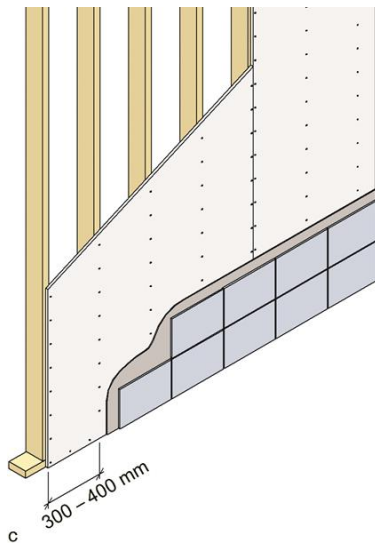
Stable Base for Tiles w/ One Building Panel on Wooden Frame w/ cc = 300–400 mm. Ref Fig 54c [54]
